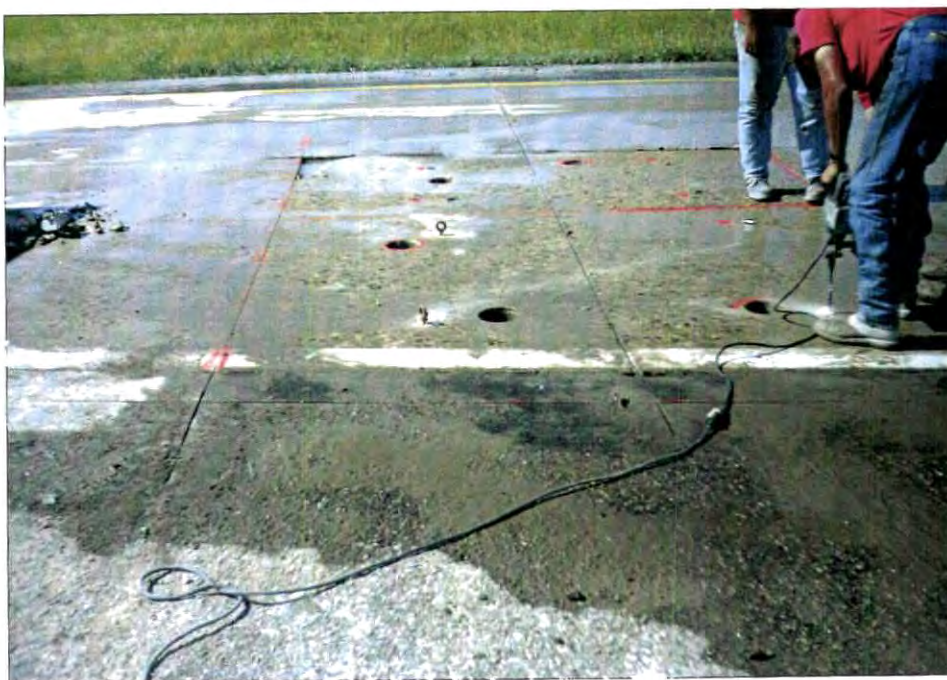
Removal of the Concrete Panels Using Hooks.
